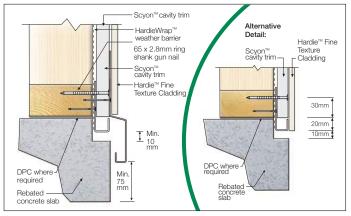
ALTERNATIVE SLAB EDGE DETAILS
